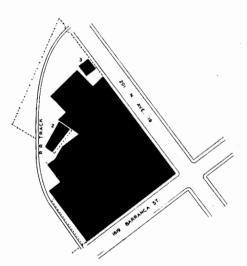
Structure Location Plan for TA-44 - Los Angeles Shop (1951 Drawing from the LANL Technical Area Structure Location Plans)
